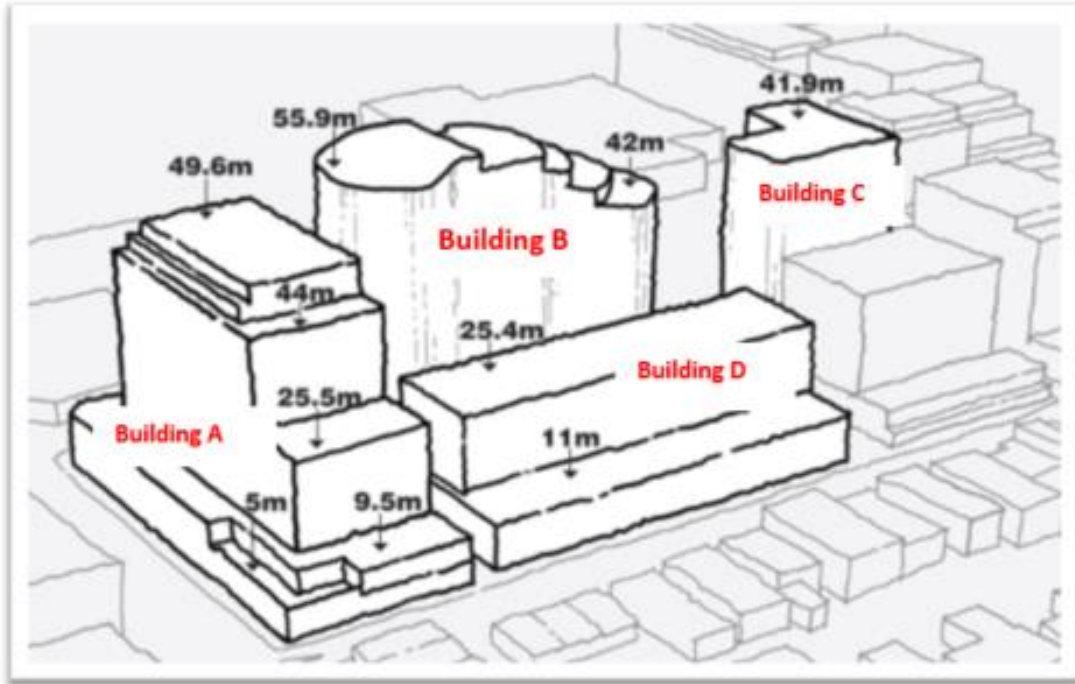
Proposed massing of buildings viewed from south-west. Source: Development Plan (Gurner 2023)
